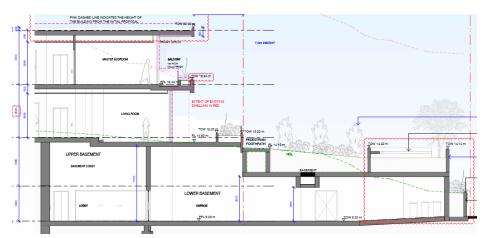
Proposed front long section - 8 Victory Street, Clovelly (Source: BJB Architects Pty Ltd)
